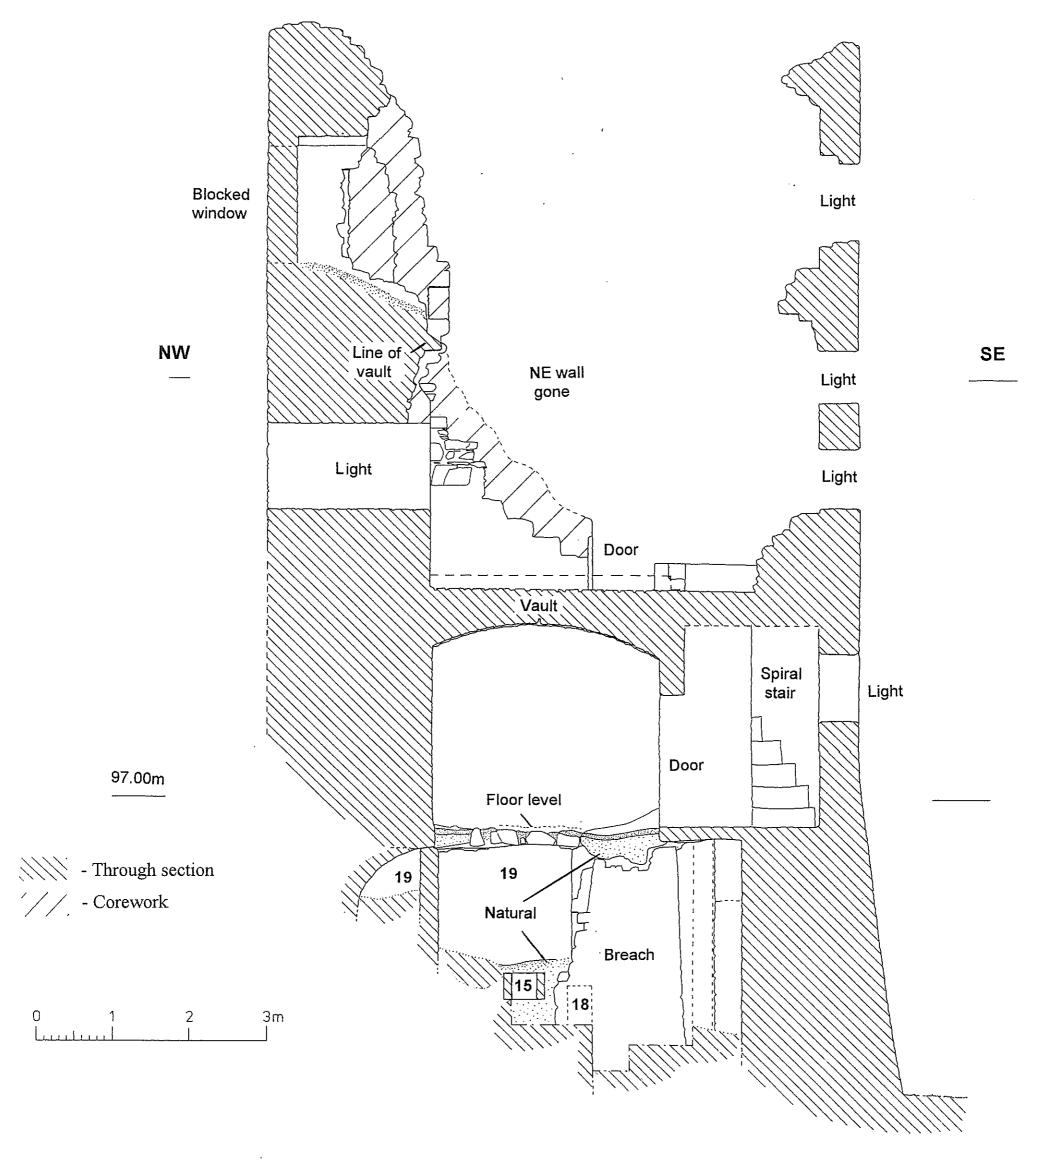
Carmarthen Castle SW Tower: North-east internal elevation
